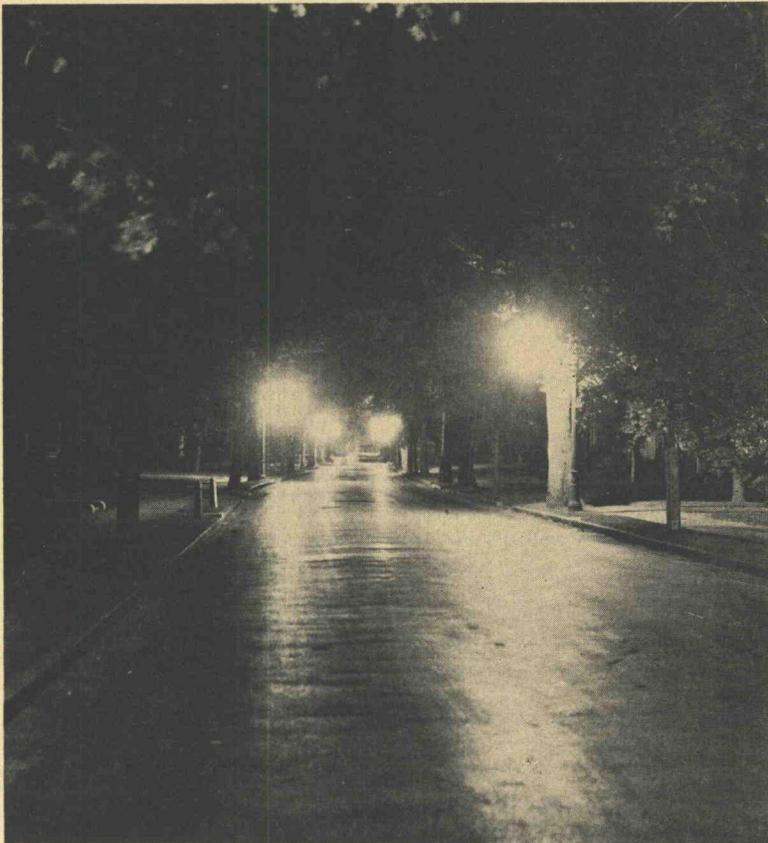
A Light Traffic Thoroughfare with Bituminous Macadam Pavement. 6,000 Lumen Lamps
